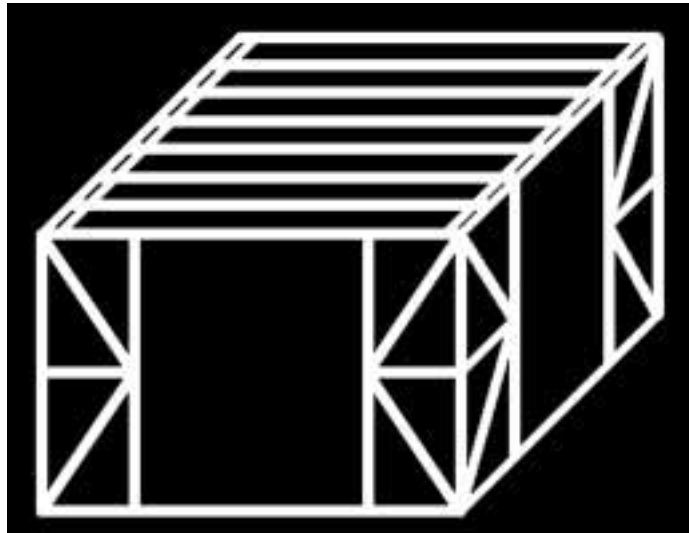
Structural system of traditional buildings in Masooleh. Wooden tie beams and tie columns plus vertical and horizontal bracings at the corners provide an integrated structure.
